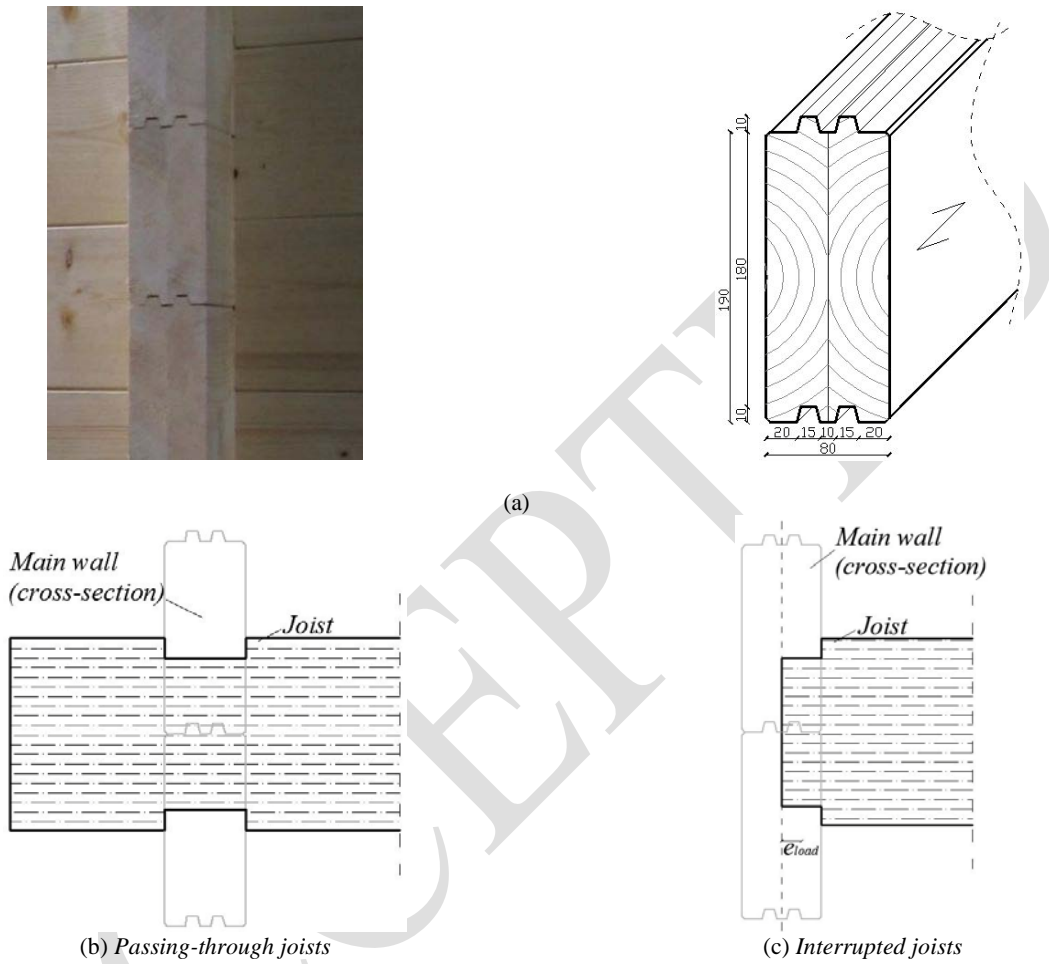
Example of (a) 'Tirol' cross-section (nominal dimensions in mm) and (b), (c) vertical cross-sections of a log-wall to inter-storey floor connection [1].
